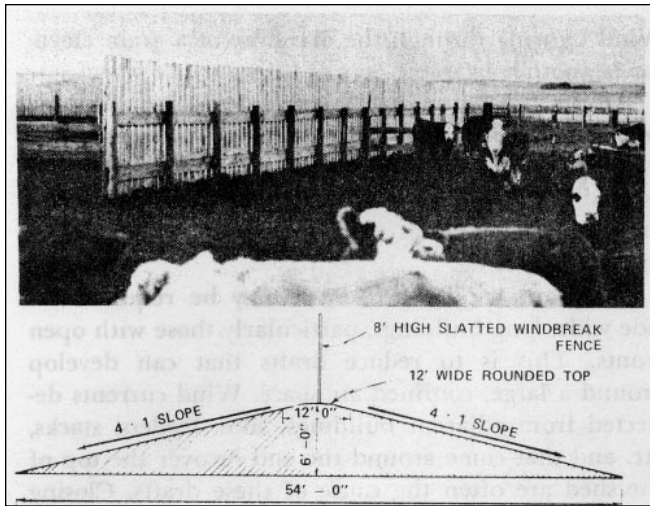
A slatted board windbreak located near center part of feedyard so cattle have access to each side. Diagram shows construction of earth mound under a fence for improved drainage.
